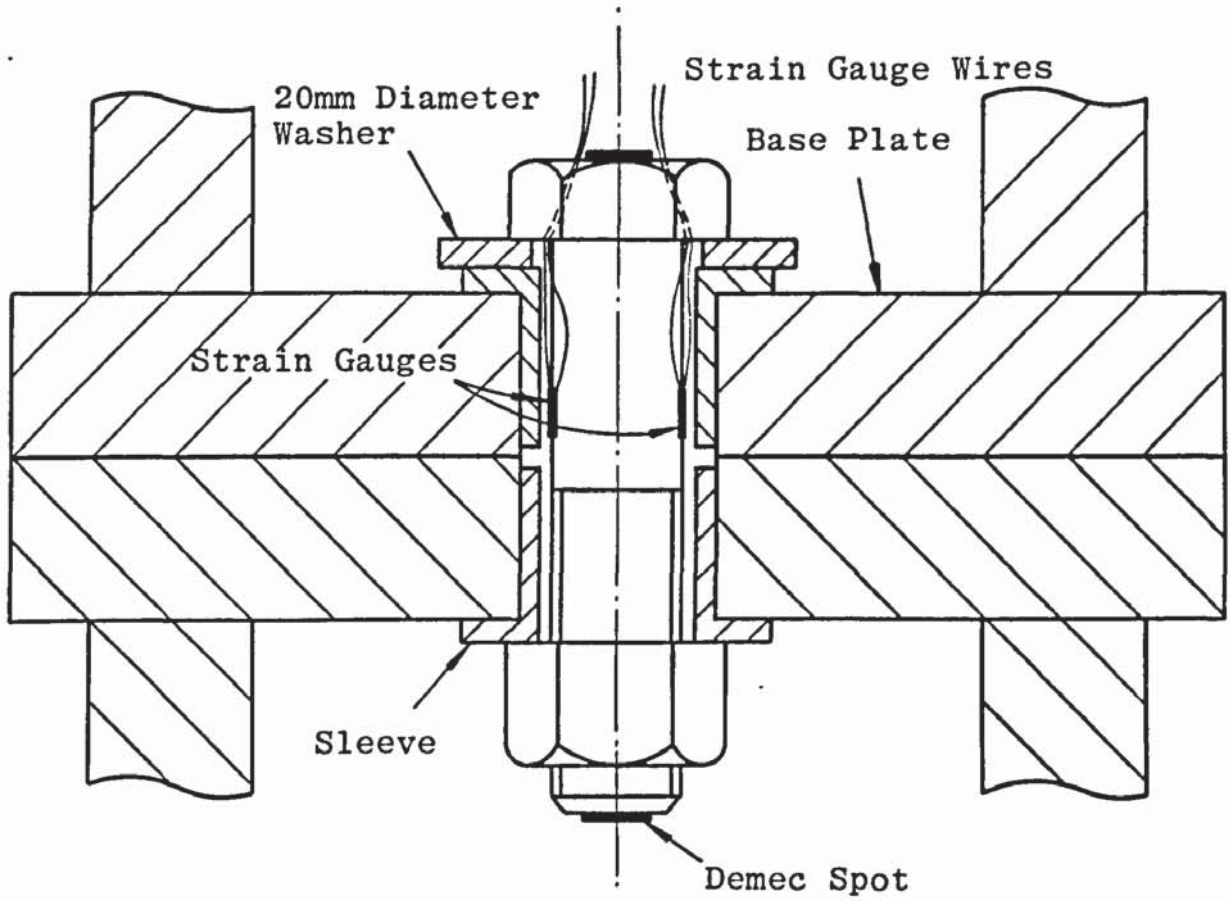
TYPICAL DIRECT TENSION TEST M16 BOLT
